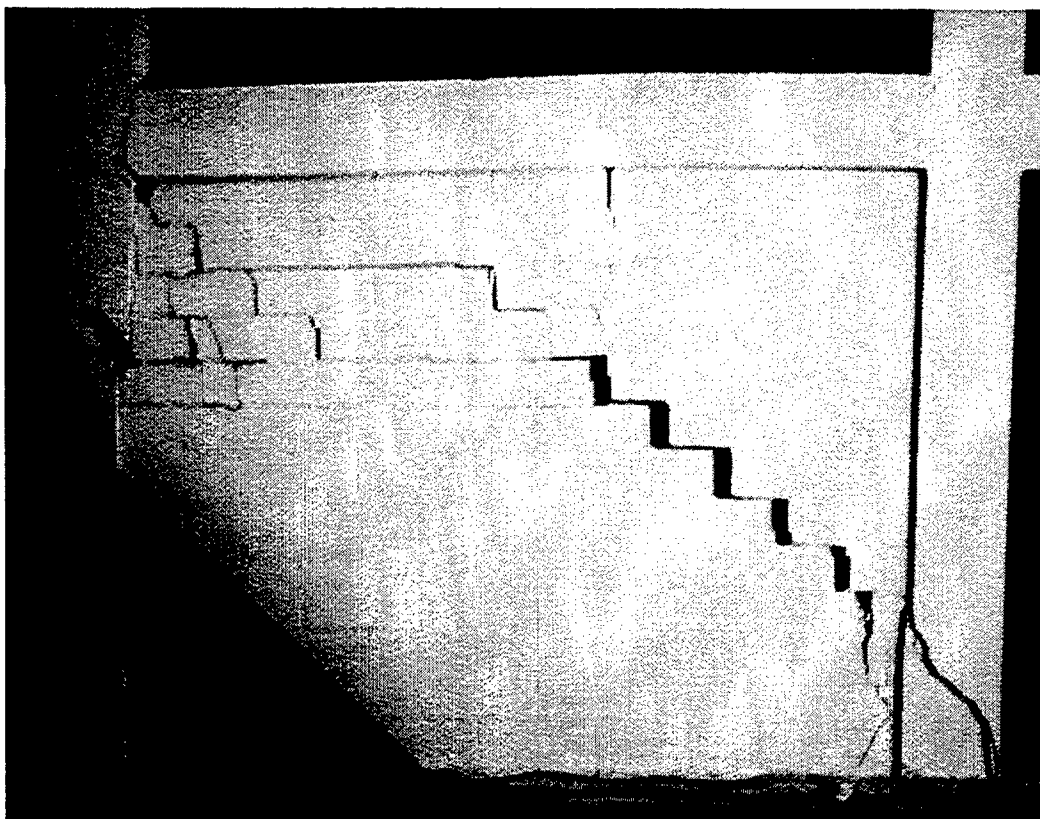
Model 2, Single-Bay CMU-Infilled Frame, Formation Of Shear Crack In The Leeward Column
